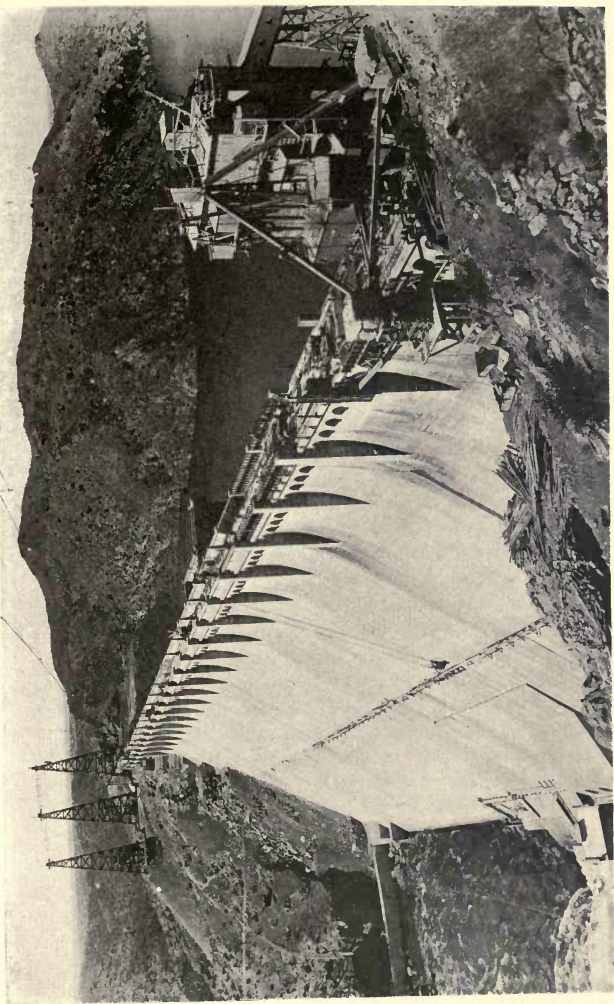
Elephant Butte Dam, Cableways and Mixing Plant, Rio Grande, New Mexico.
